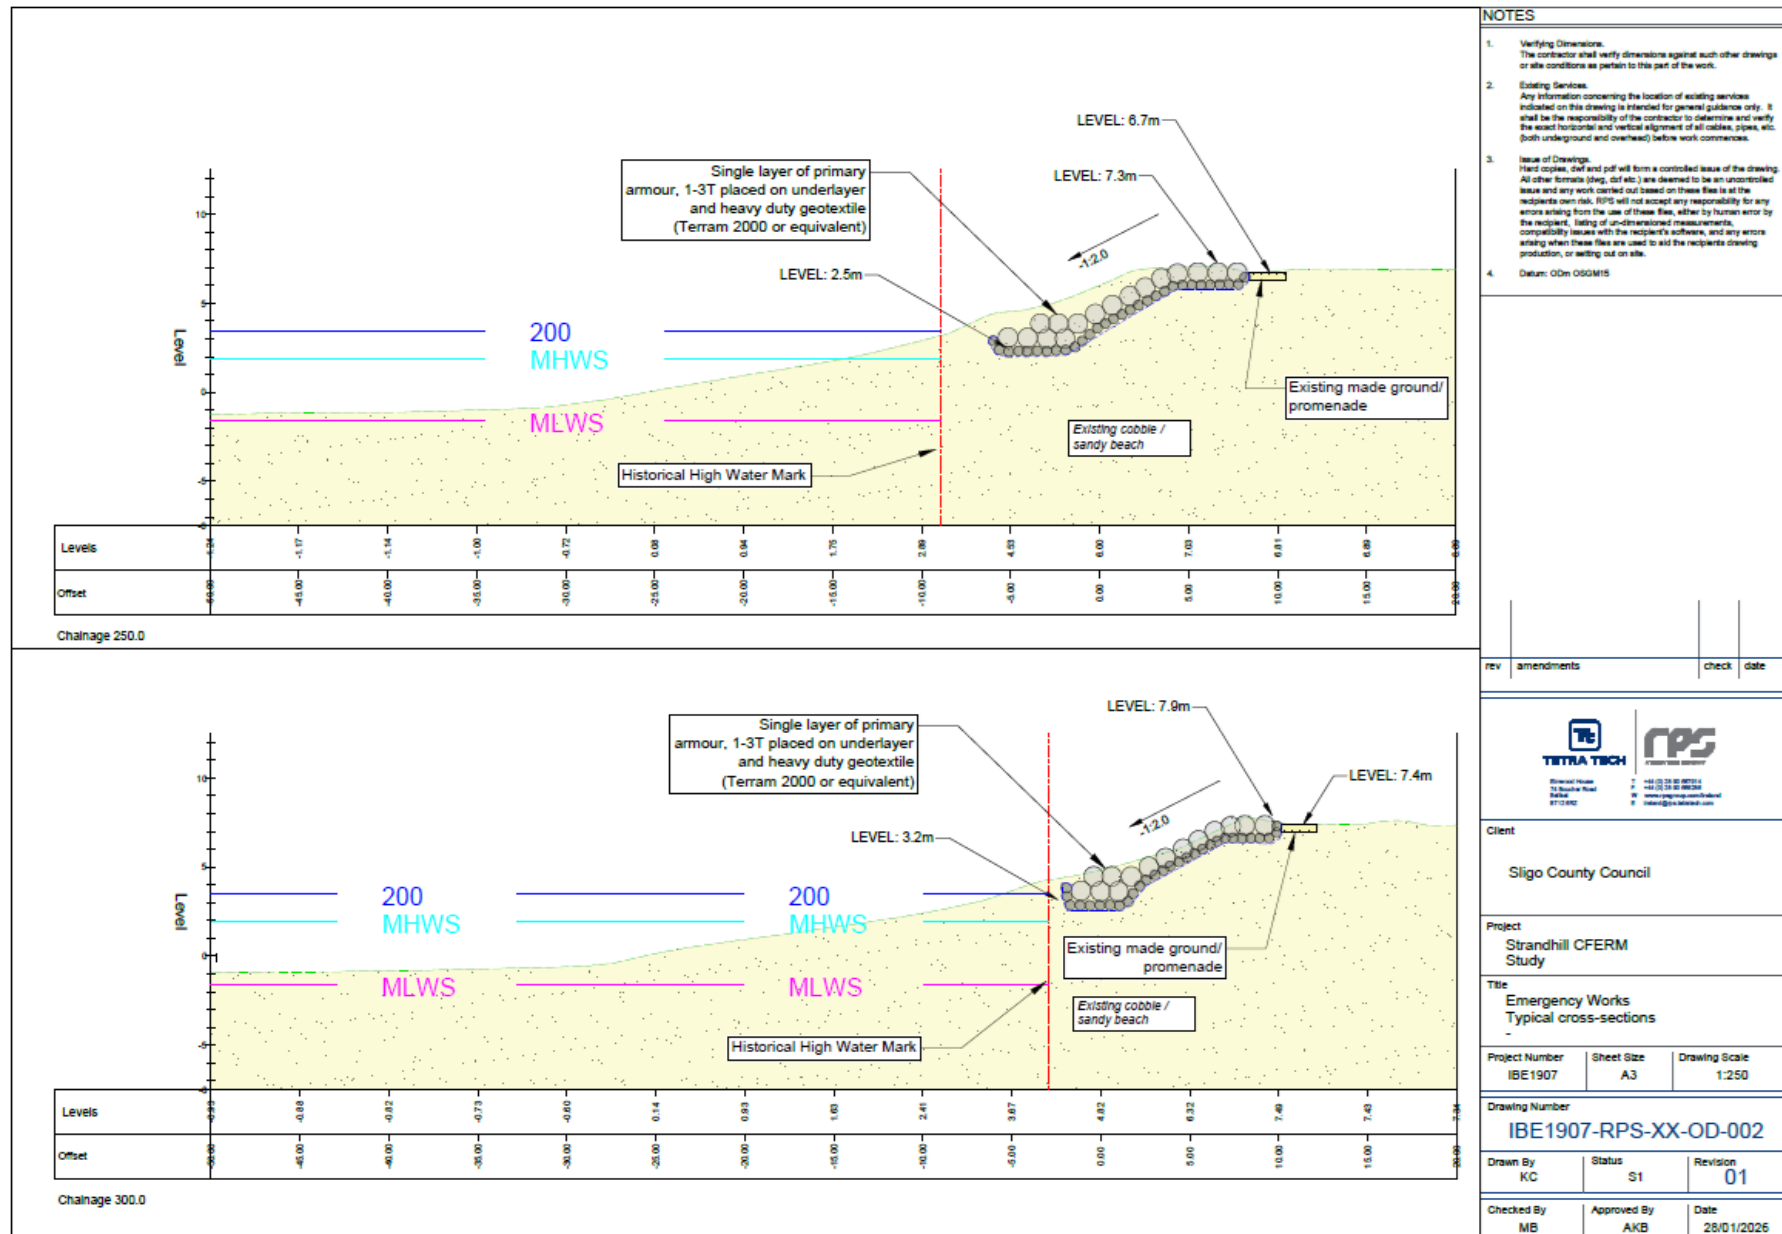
Typical cross-sections for the proposed emergency works at Strandhill
